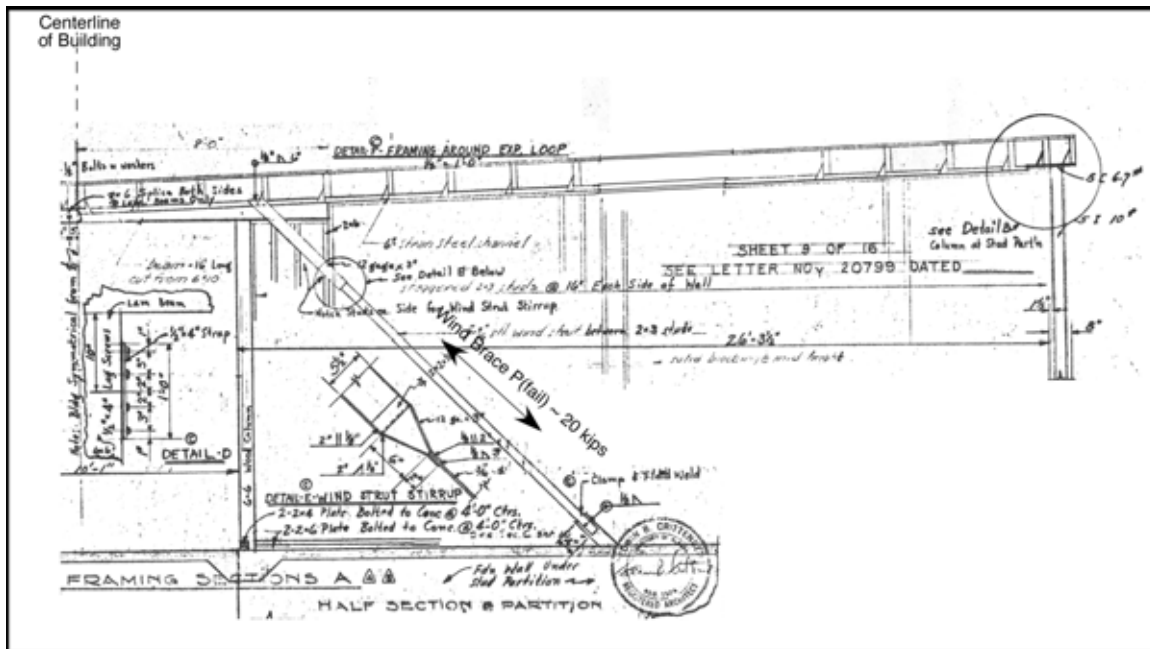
Cross Section Through Classroom Wall (Typical for 1946 Section)
